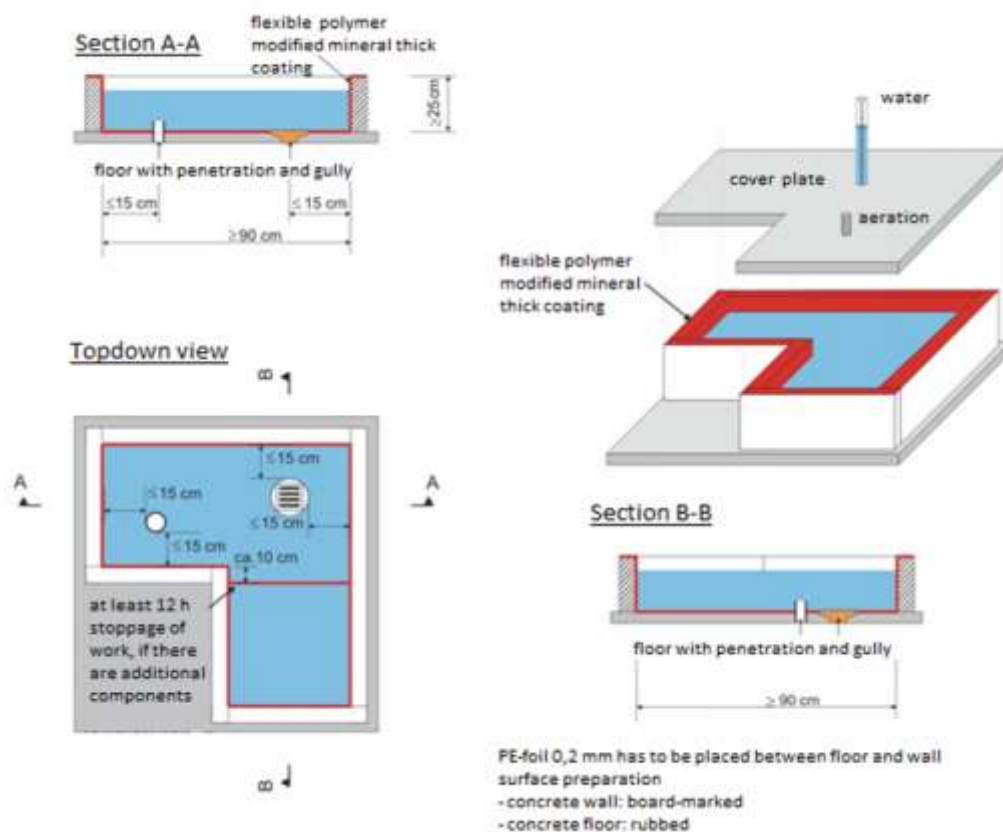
Principle of construction for determining watertightness when installed
